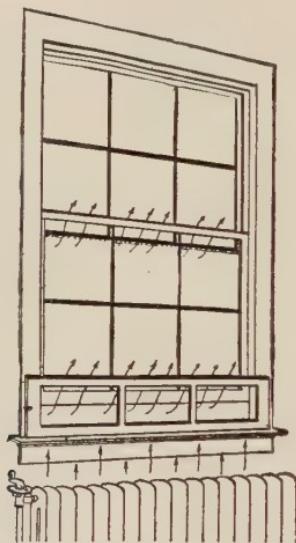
Air entering room through window open at bottom. Deflector in place.
